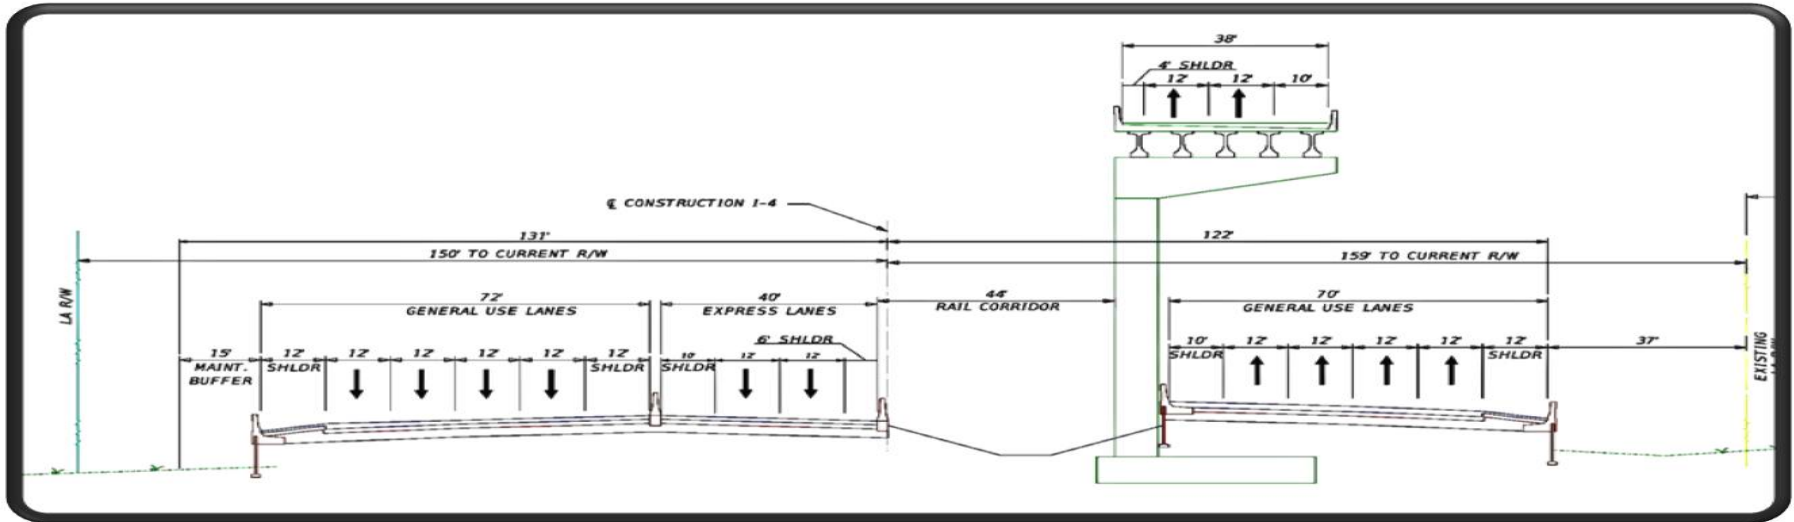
SR 400 (I-4) Segment 1 Proposed Typical Section (elevated EB Express Lanes between SR 429 and World Drive)
